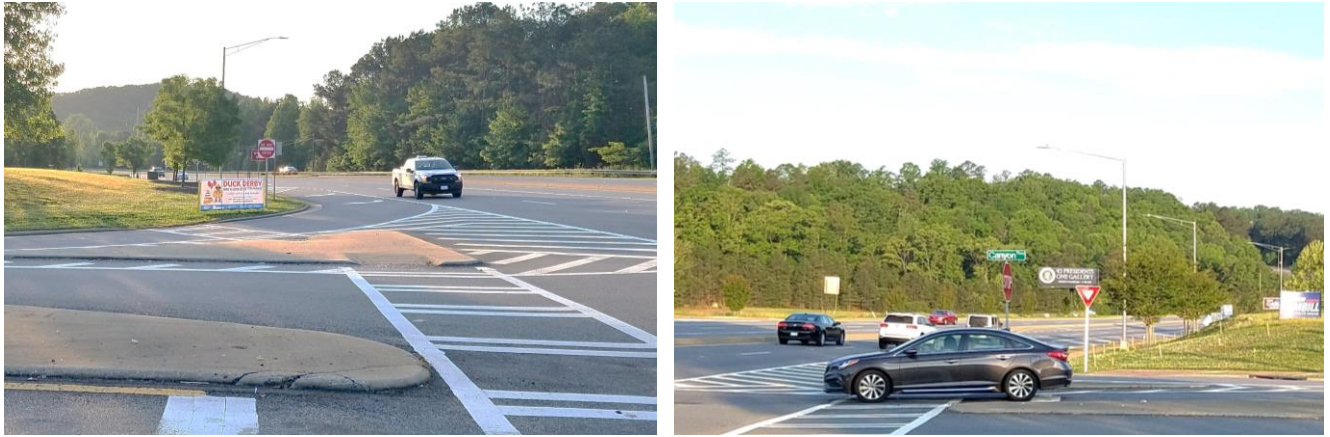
North Leg (Canyon Parkway) – looking east (left); looking west (right)
